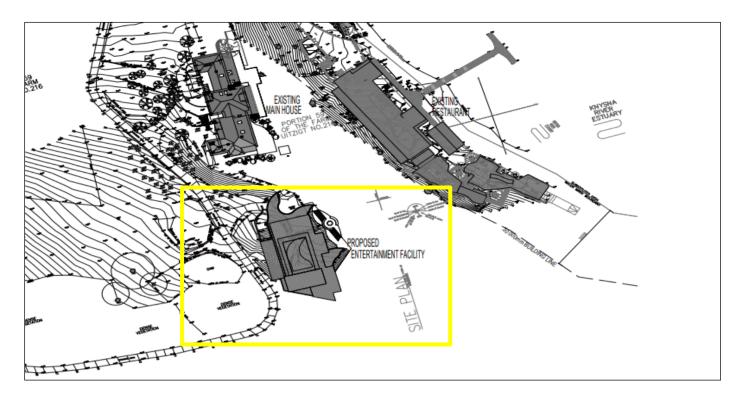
Proposed Entertainment facility (TMBA, 2024)
